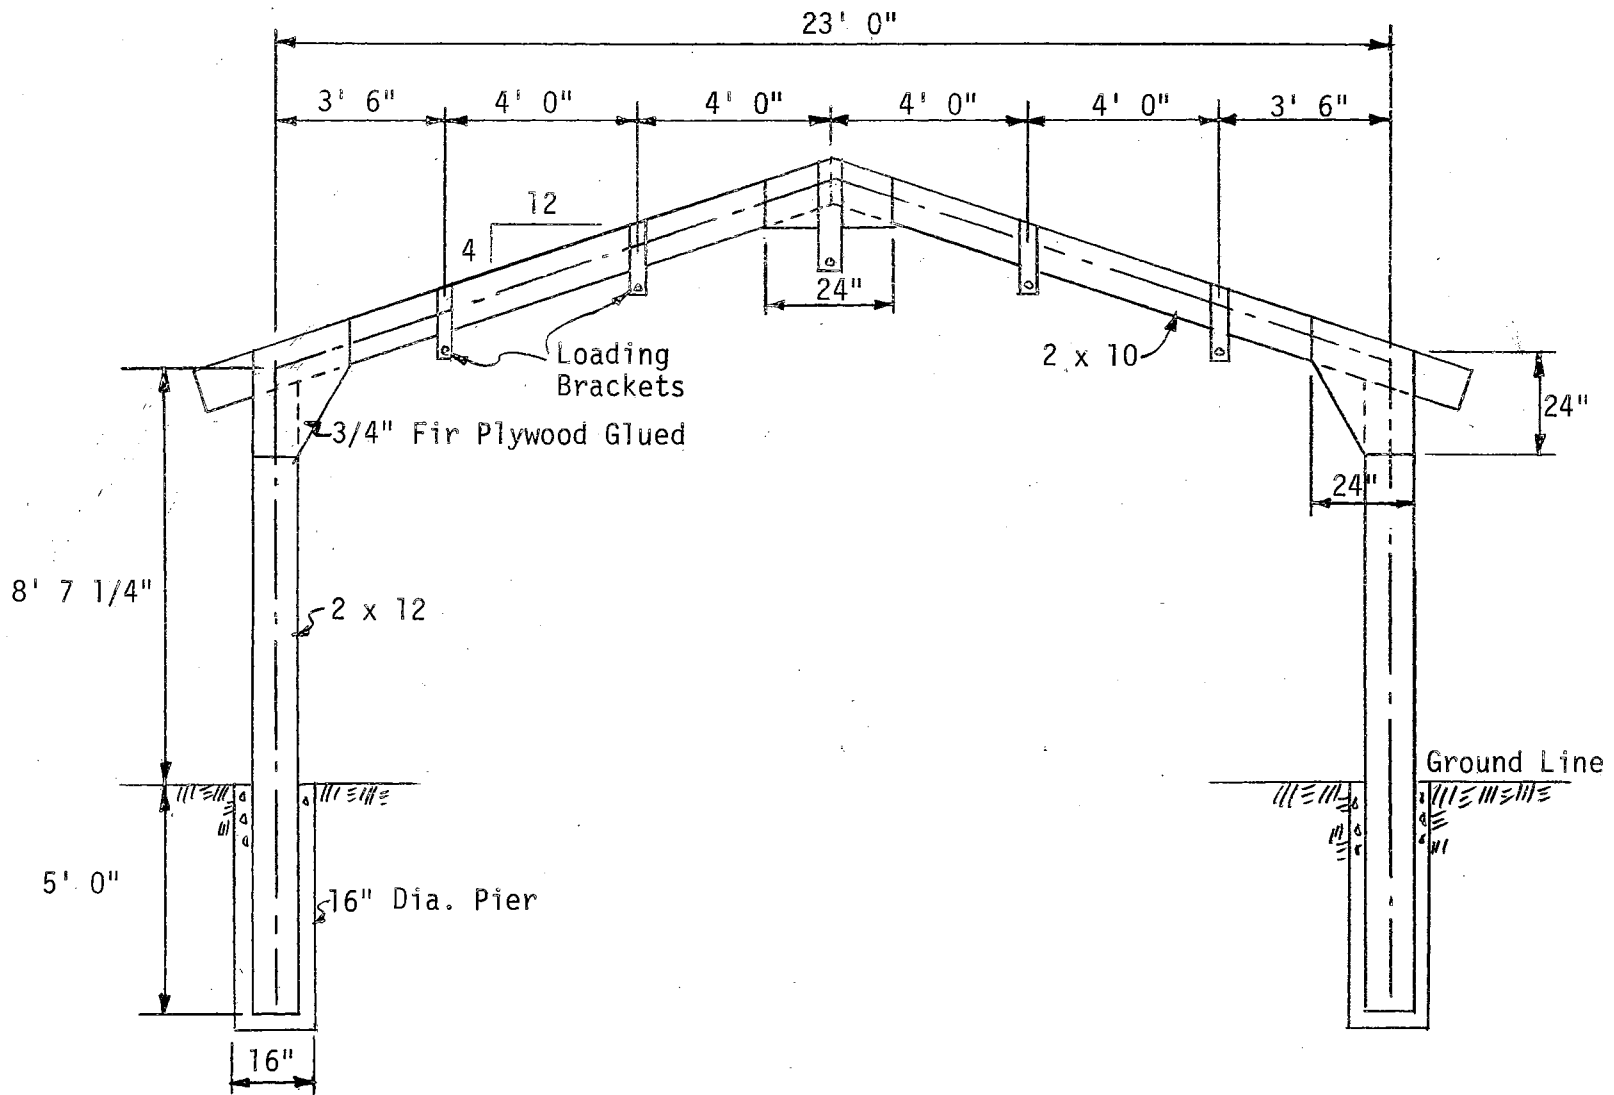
Construction Details and Dimensions of the Full-Size Wooden Frame.
